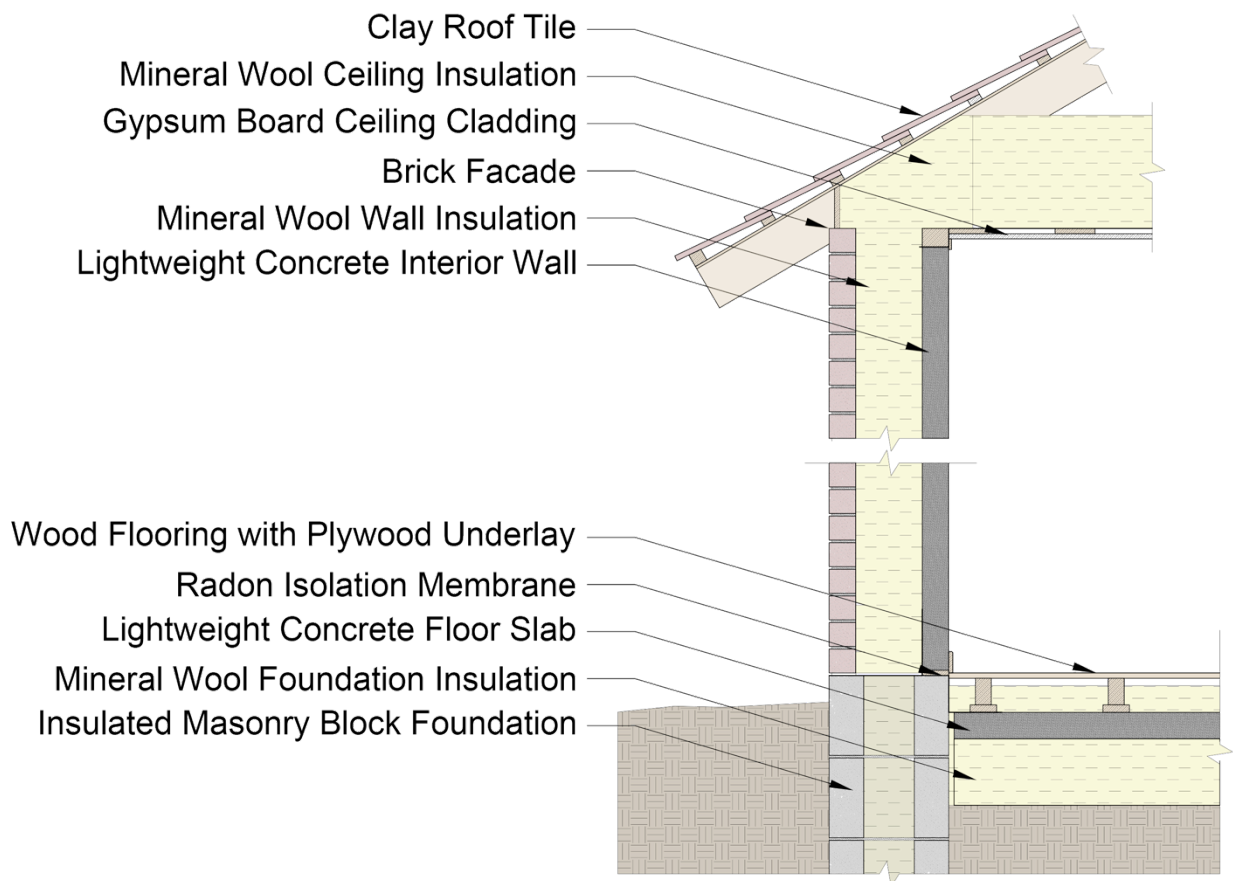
Schematic drawing of Brick cavity wall with lightweight concrete interior wall and floor slab
